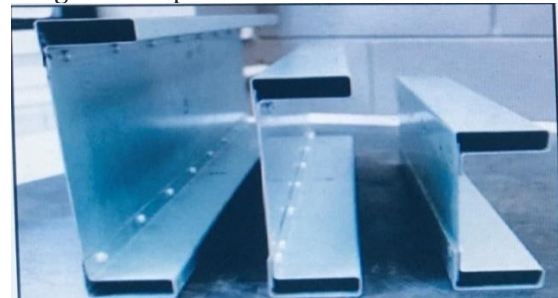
Rivet Fastened Rectangular Hollow Flange Channel Beam [4].
